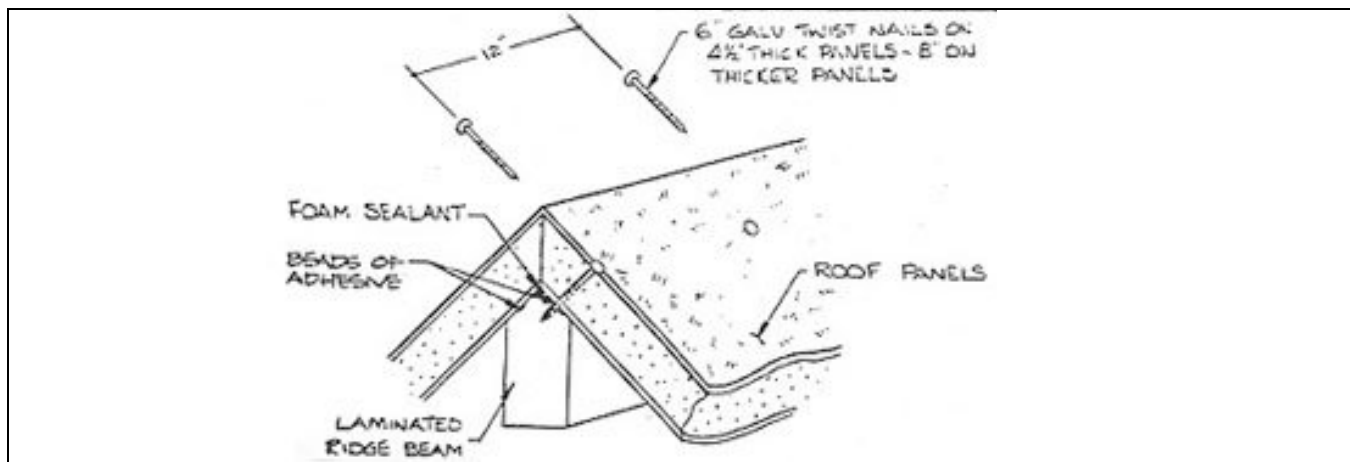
Securing Panels at Ridge: Roof panels are miter cut at the ridge and secured with twist nails 12" o.c.
